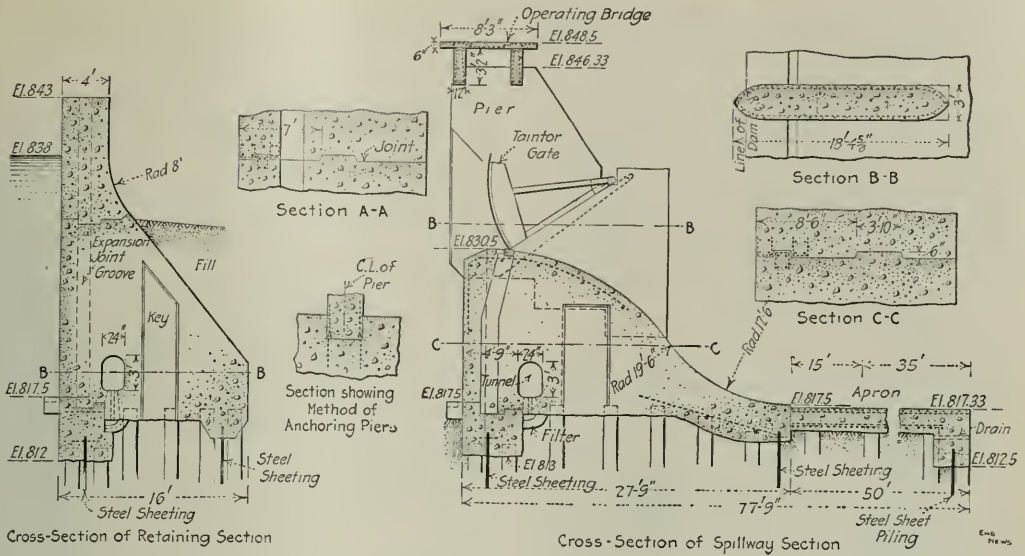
CROSS-SECTIONS OF DAM, SHOWING THE SPILLWAY SECTION AND RETAINING SECTION
